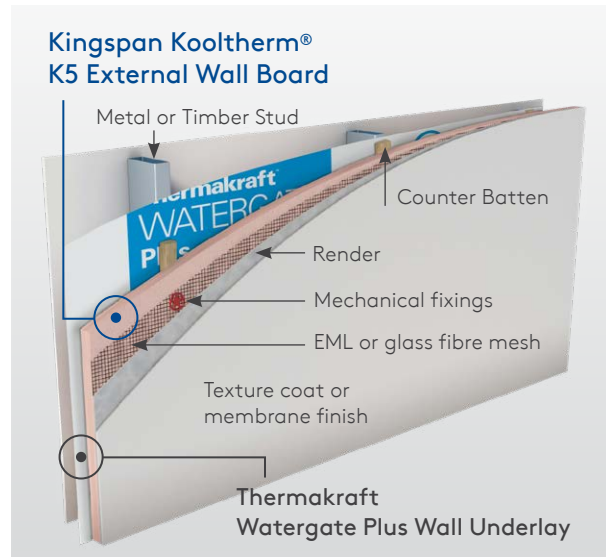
Insulated Render System on Steel-framed or Timber-framed Wall
